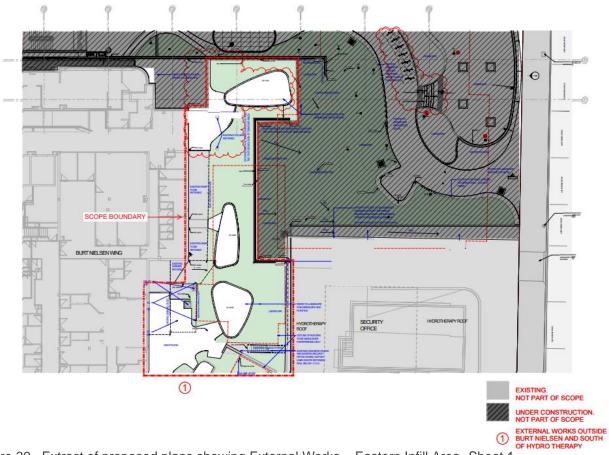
Extract of proposed plans showing External Works – Eastern Infill Area- Sheet 1
